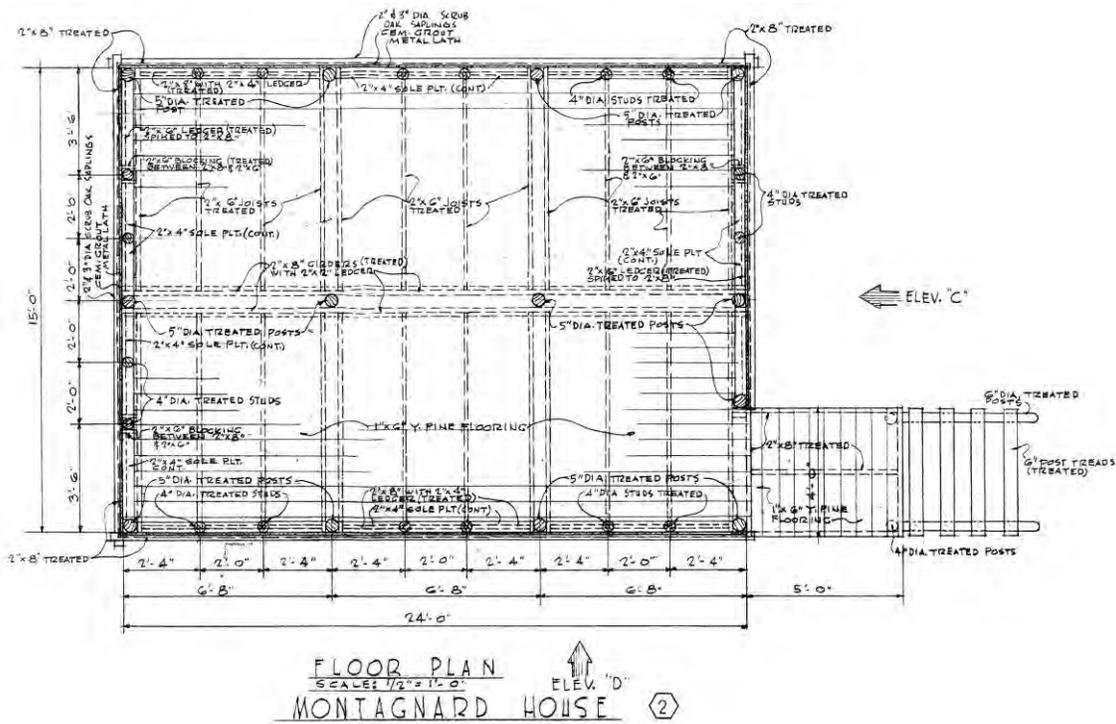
Montagnard house floor plan, Camp Gordon, 1966 (standard drawing GOR 28-13-09 sheet 16, Vietnamese and Montagnard houses plans, elevations, and sections, 1 April 1966).
